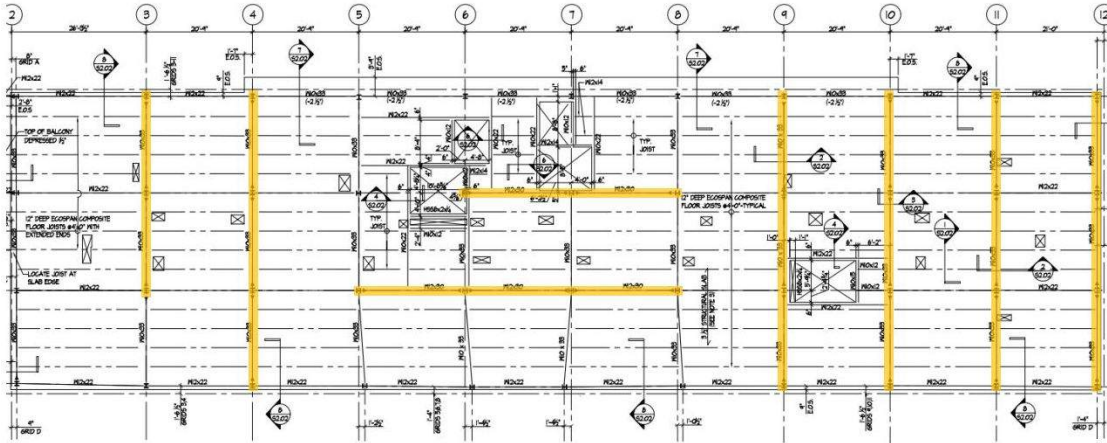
Moment Frames shown highlighted on typical floor plan. From Drawing S1.07
